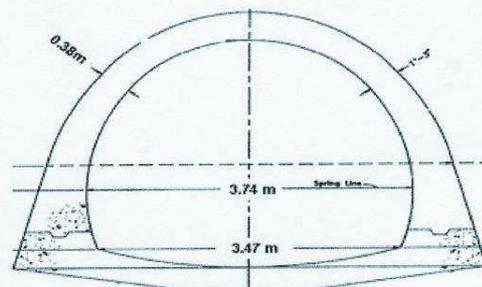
Typical cross section of North Outfall Sewer (NOS)
